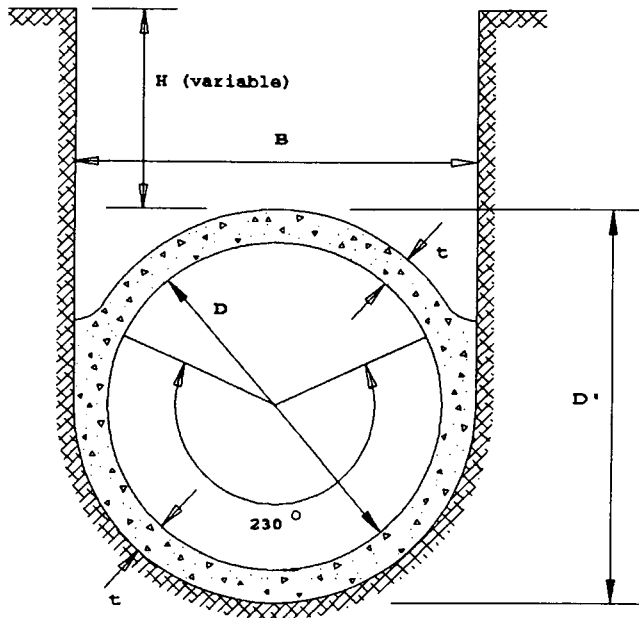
Typical cross section of cast-in-place concrete pipe [610–3048 mm (24–120 in.)].
